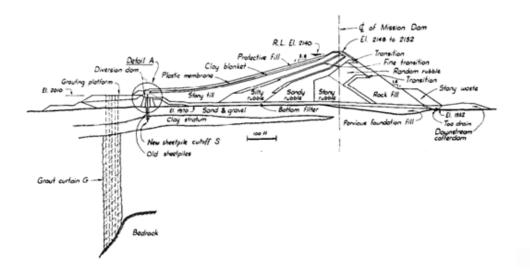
Cross-Section of the Mission Dam (Terzaghi & Lacroix 1964)
